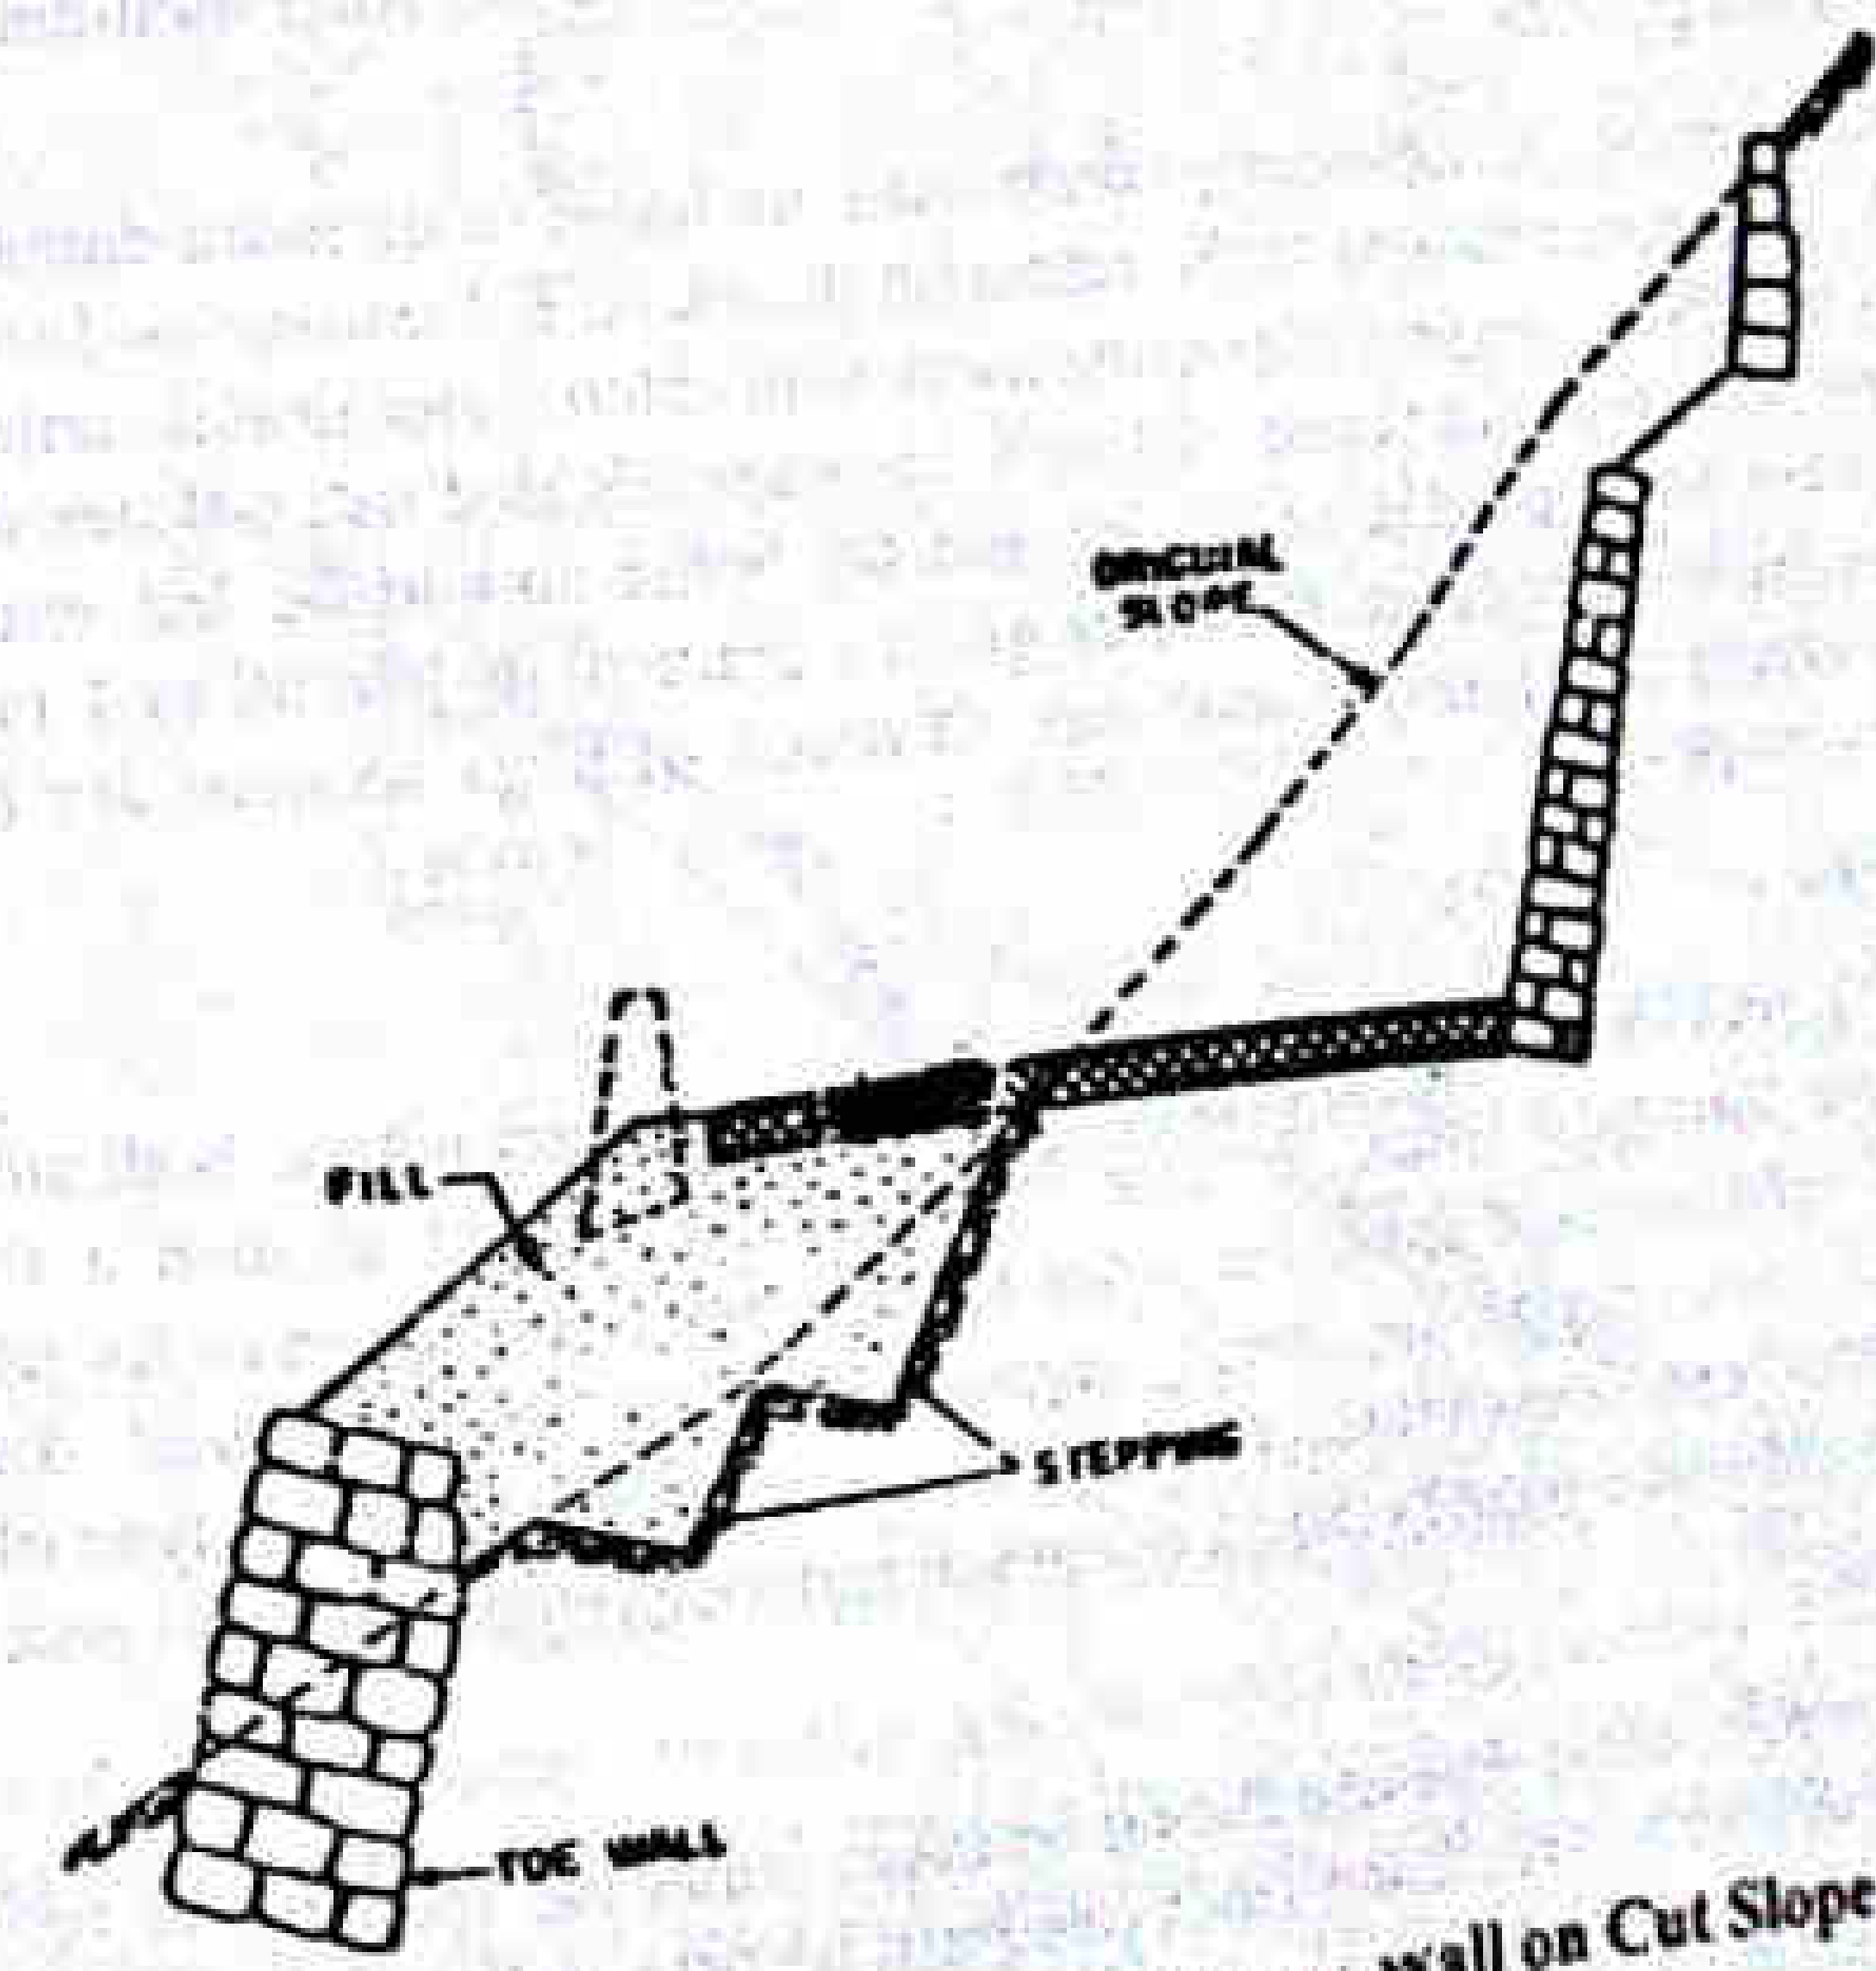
Toe Wall with Revetment wall on Cut Slope
